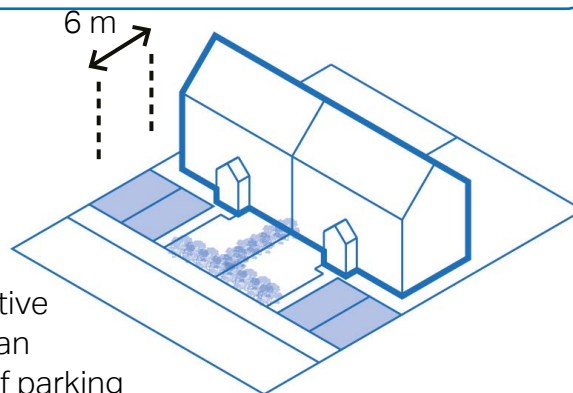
Illustrative diagram showing an indicative layout of parking types.
